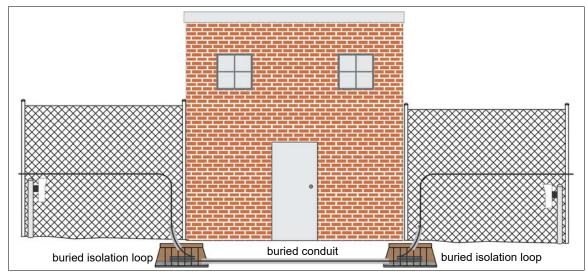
Perimeter structure bypass (below ground with buried vaults)
